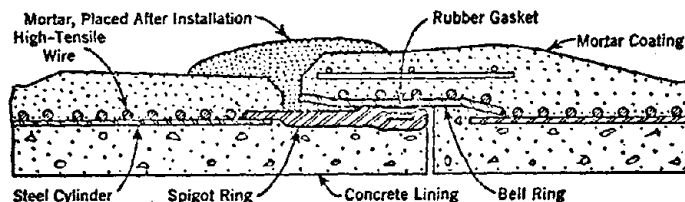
Lined-Cylinder Prestressed Concrete Pipe and Joint PCC
